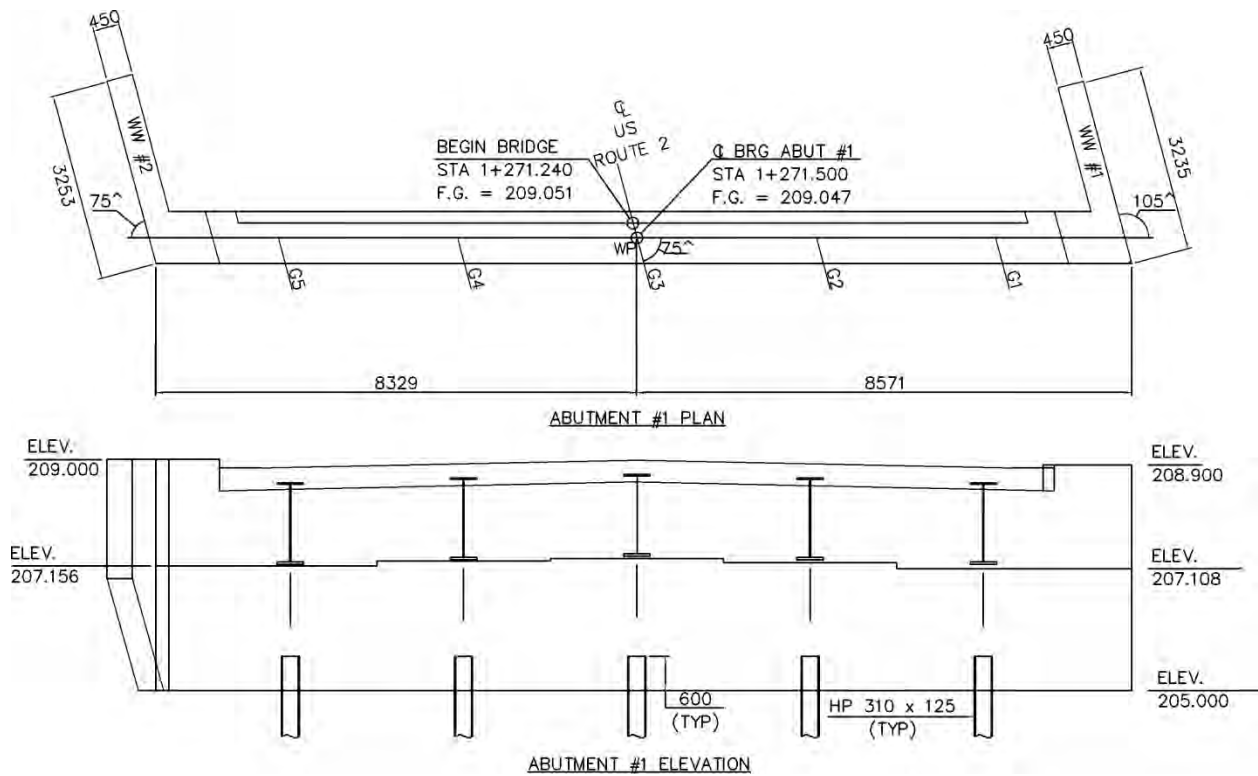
Plan and Elevation View of Abutment 1 at East Montpelier Bridge
